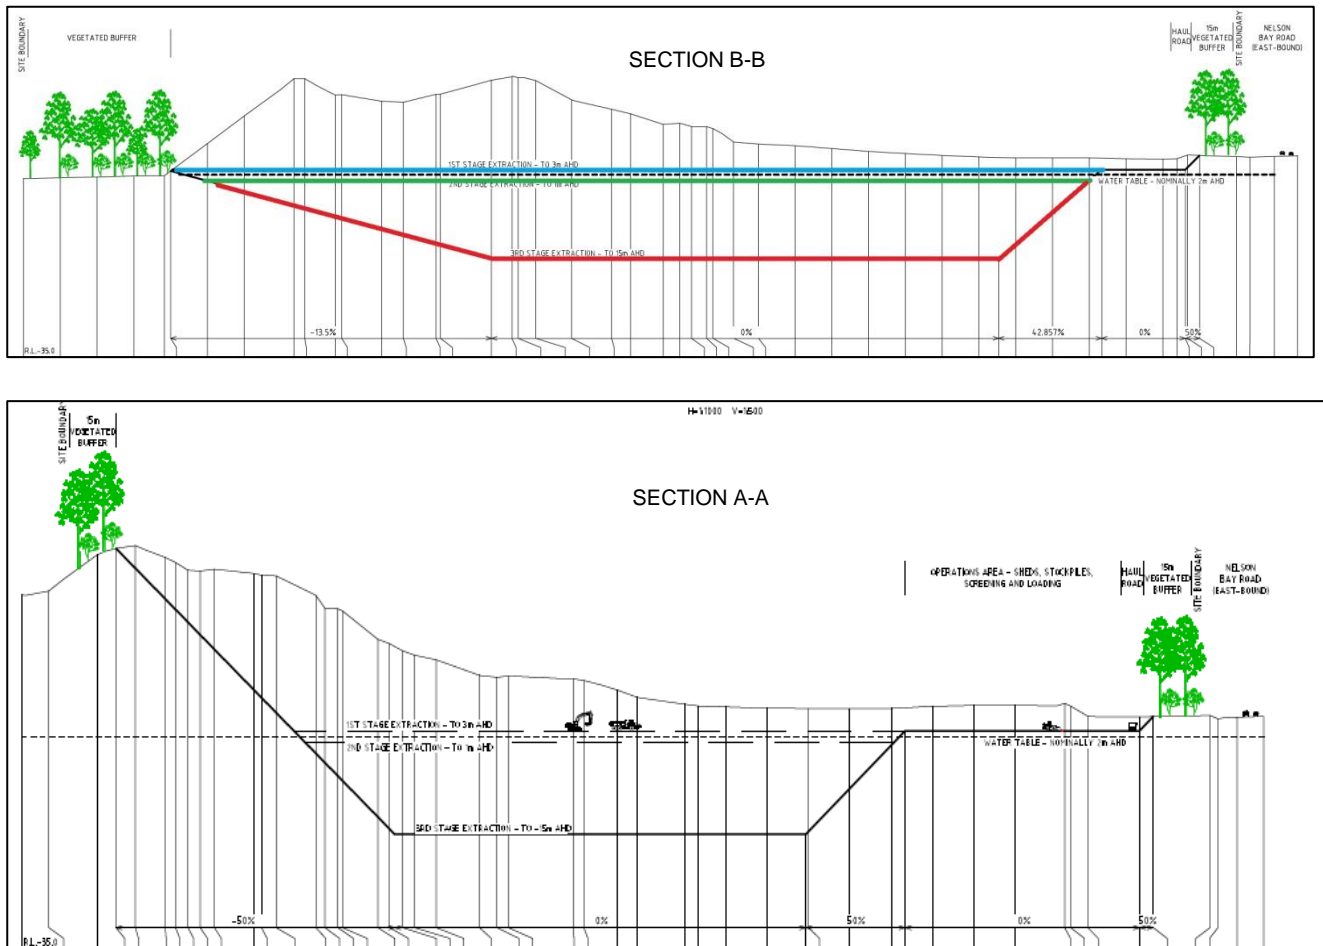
Production Stages (Section B-B and Section A-A) [Tattersall Lander]
